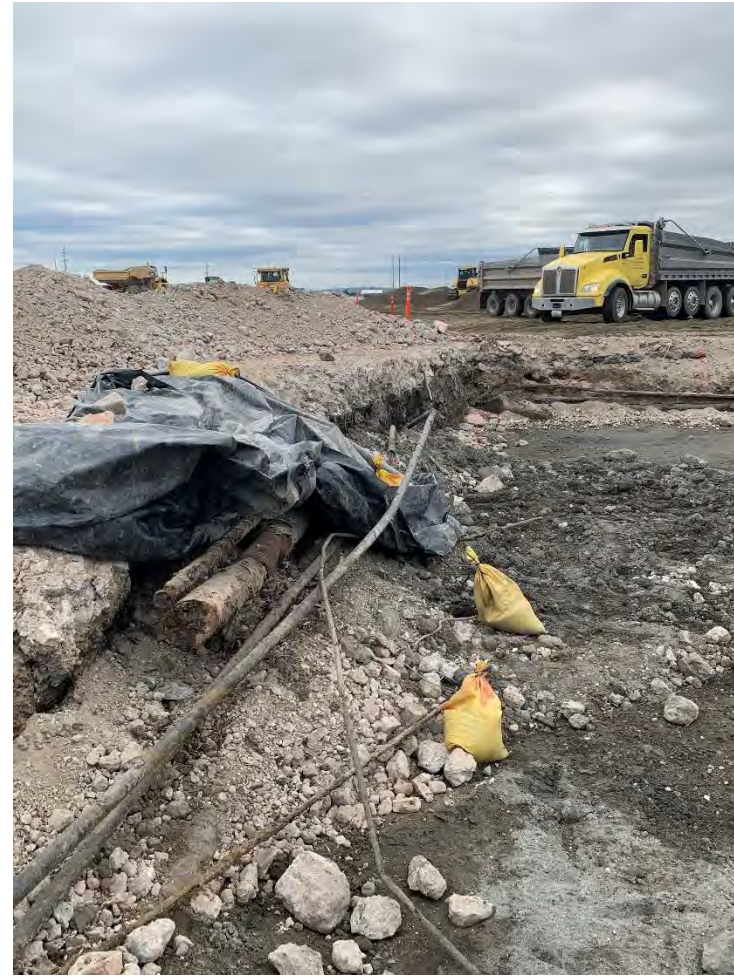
Open excavation prior to dewatering on 8/10/2020, view looking northeast.
